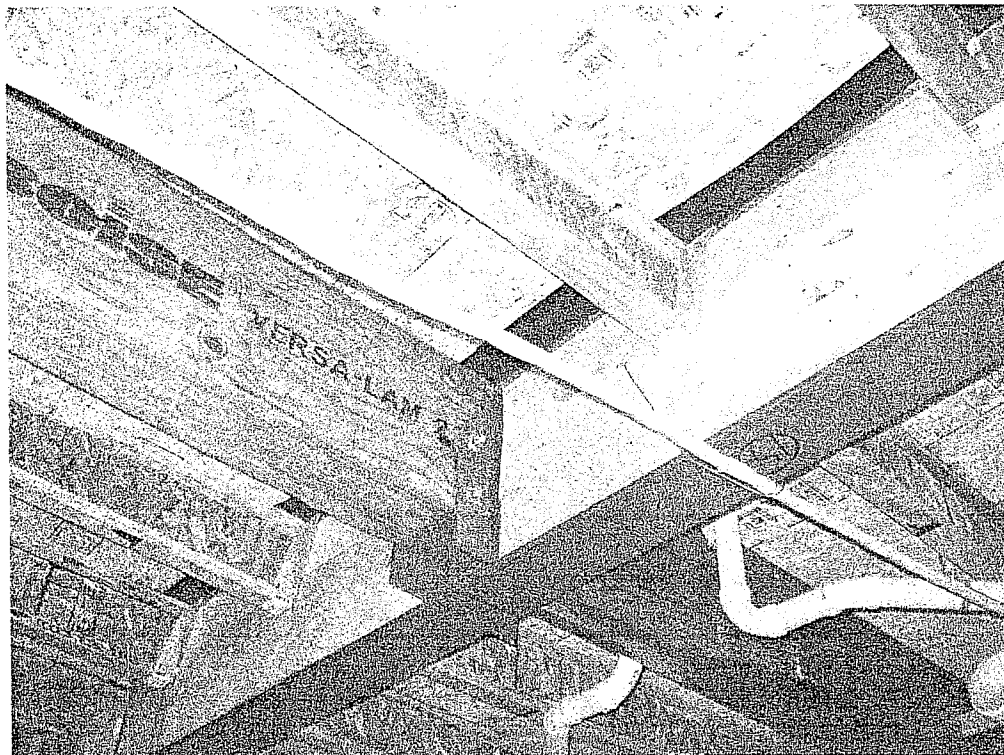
Versalam Beam to structural steel connection at gridline 3/B
